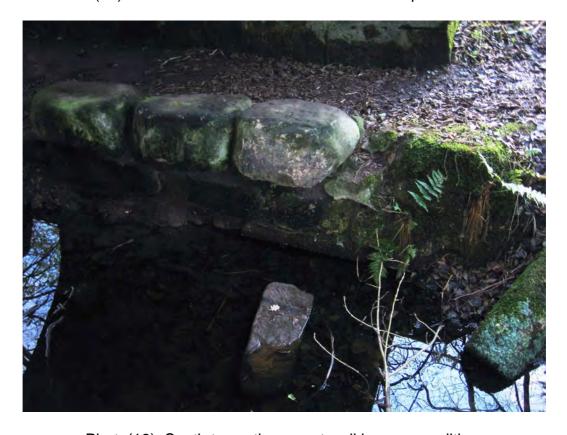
North abutment and arch ring, note water penetration to apex of arch.
